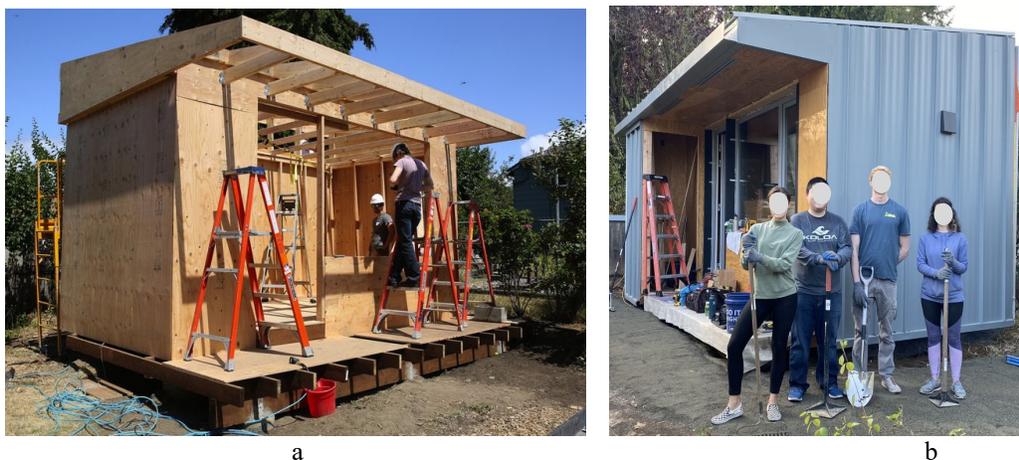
Accessory Dwelling Unit a) under construction, b) Student volunteers at work
